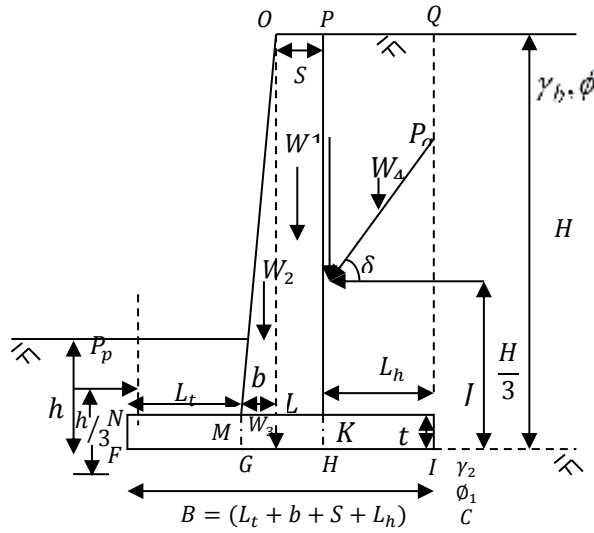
General layout of a RCC cantilever retaining wall showing dimensions and different forces acting on it.
